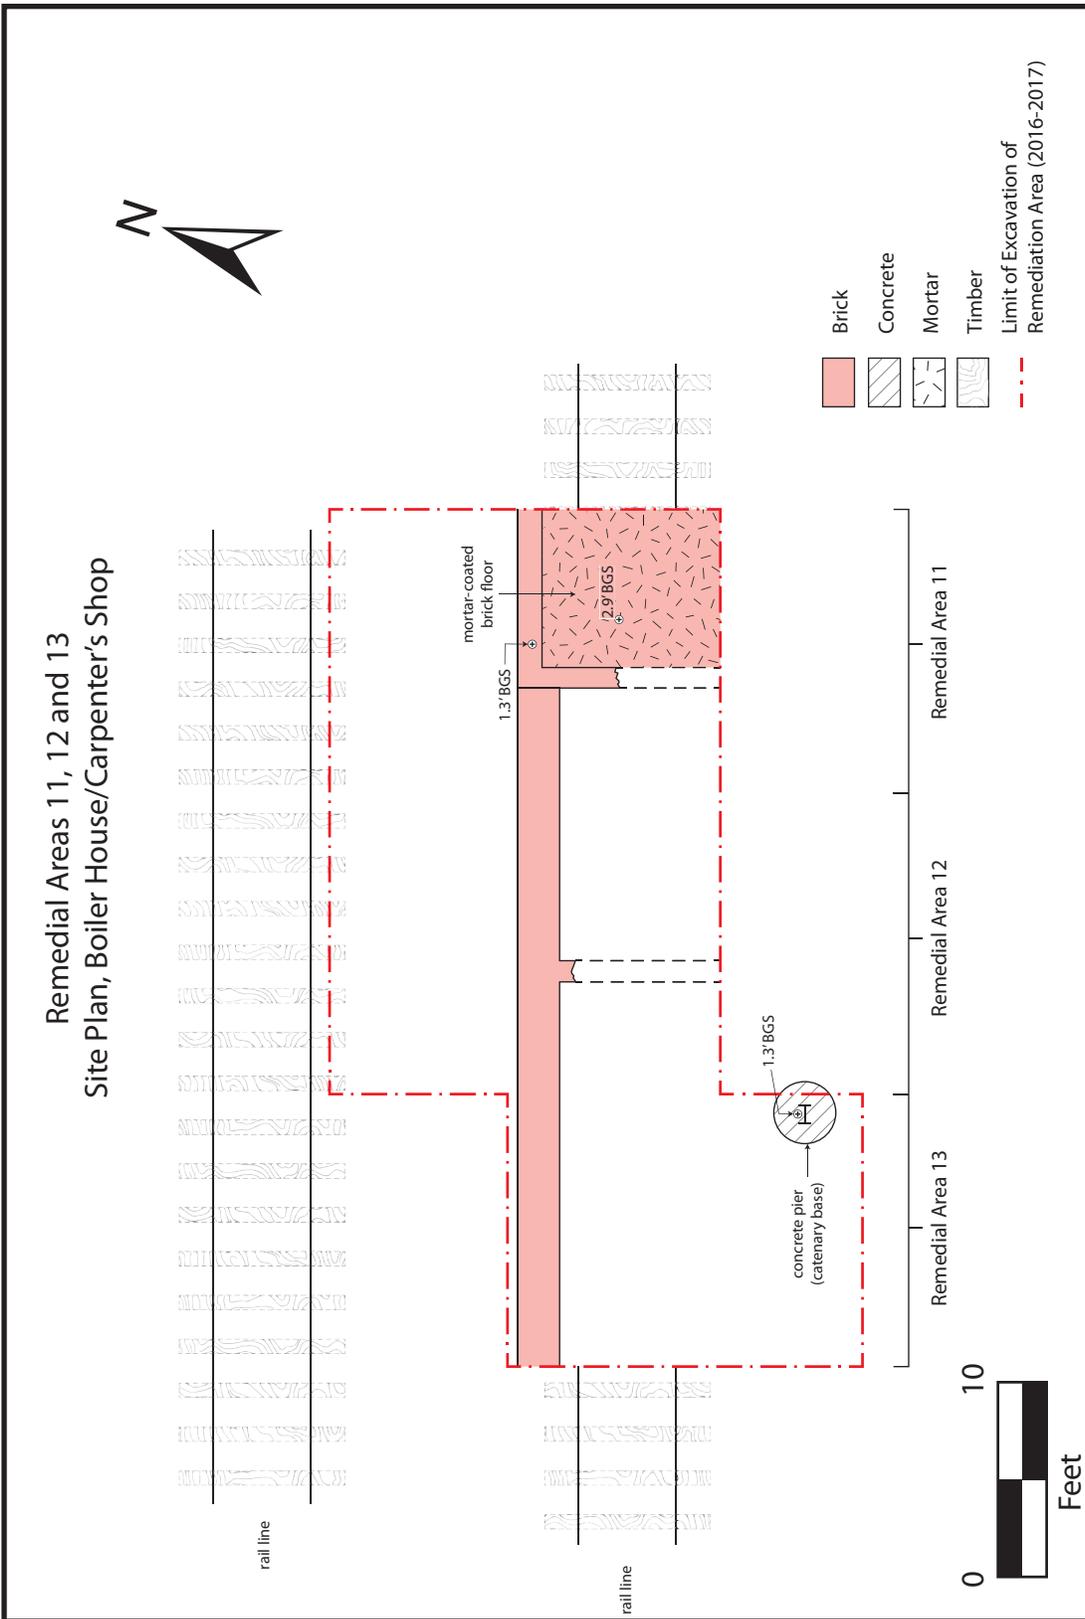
Remedial Areas 11, 12 and 13, Site Plan, Boiler House/Carpenter's Shop.
